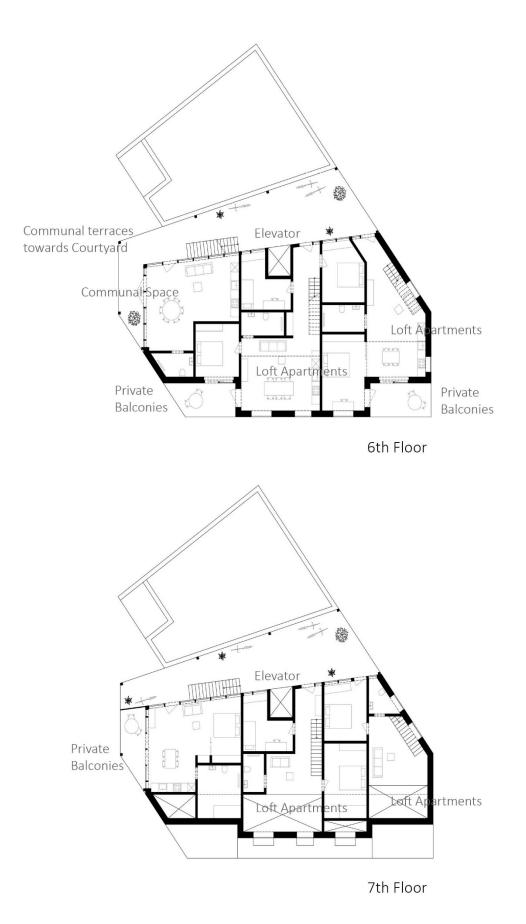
Floorplans of addition at Tagensvej (Duplex loft apartments 2/2), Scale 1:250 (A4)
